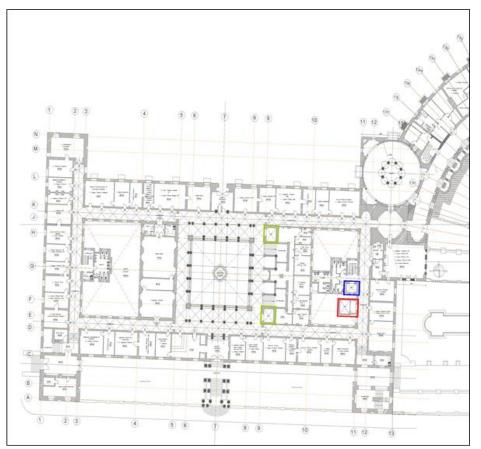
\_Union Buildings\_Overall Ground Floor Plan - West Wing, Amphitheatre and East Wing
